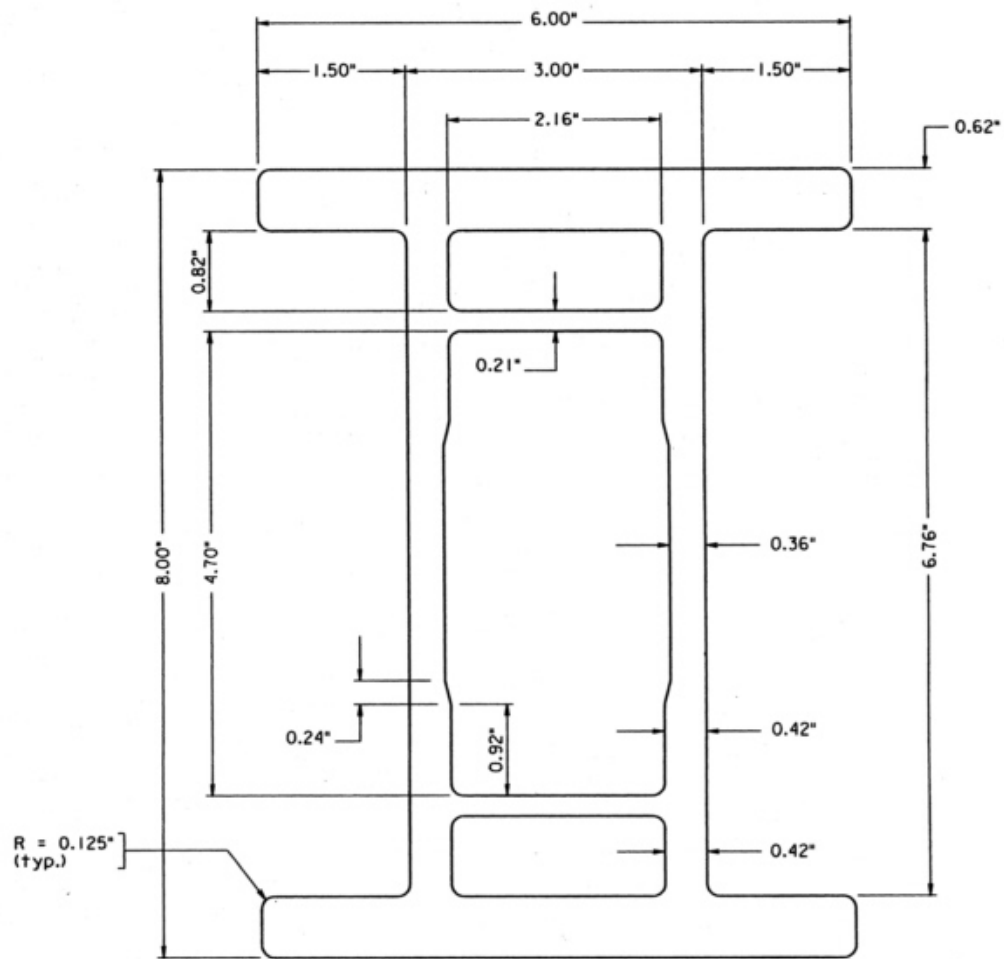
Cross-section of the 20.3 cm (8 in) ATP prototype.
